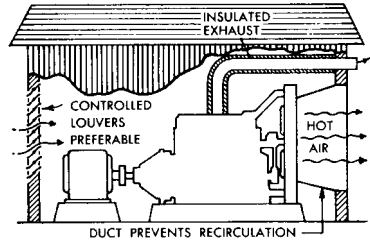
Radiator cooling system for an inside installation (Waukesha Motor)
